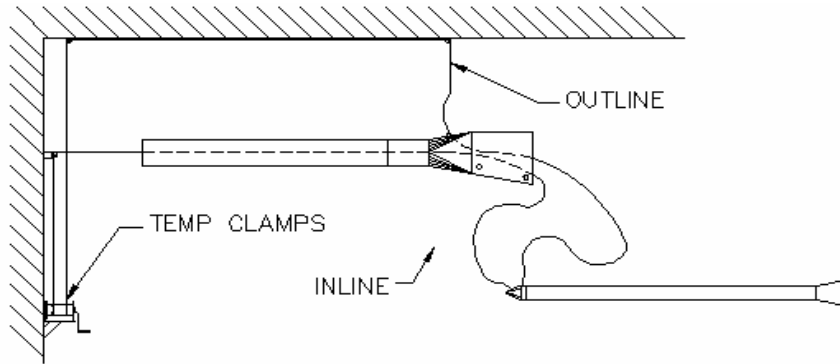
A: ATTACH BOTH LINES TO HOSE GUIDE ON FLEX ASSEMBLY
